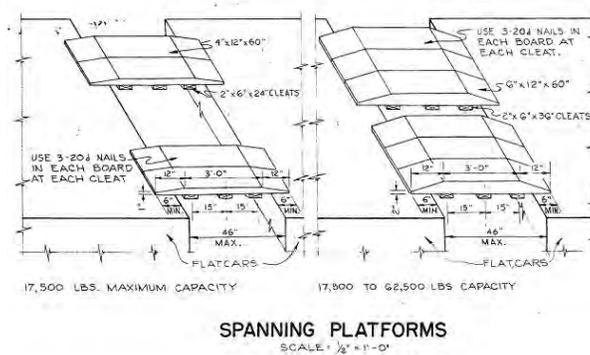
Rail movement mock-up, spanning platforms, Fort Bragg, NC, 1952 (standard drawing 28-13-100 sheet 1 of 4; rail movement mock-up, concrete alternate, plan, elevations, and details; 6 February 1952).
